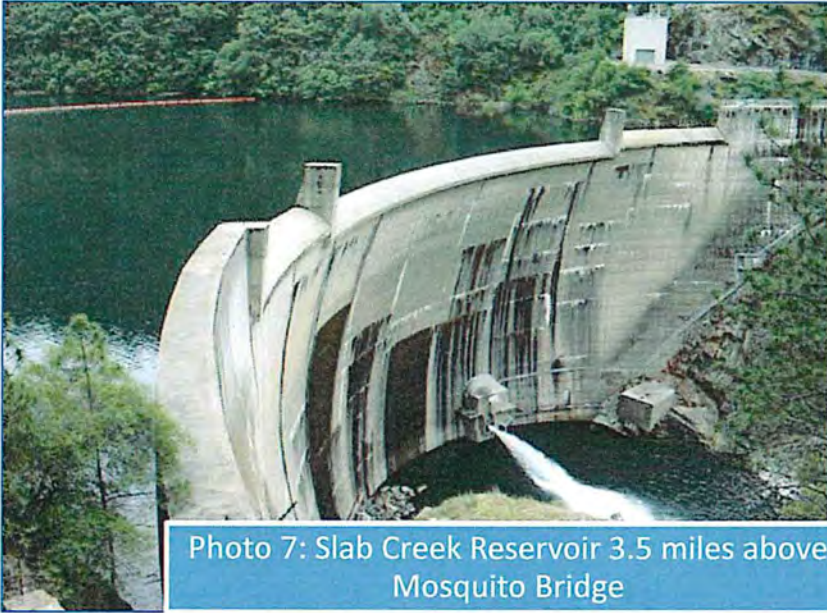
Slab Creek Reservoir 3.5 miles above Mosquito Bridge
